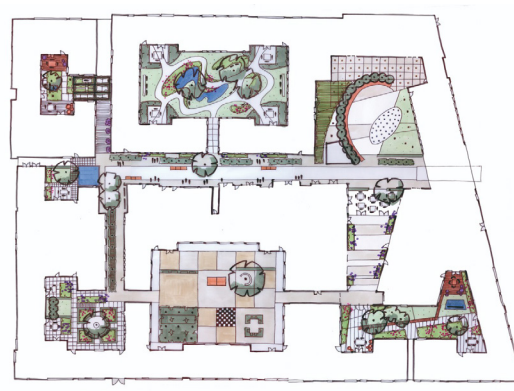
Landscaping plan. Copyright The Hogeweyk.
